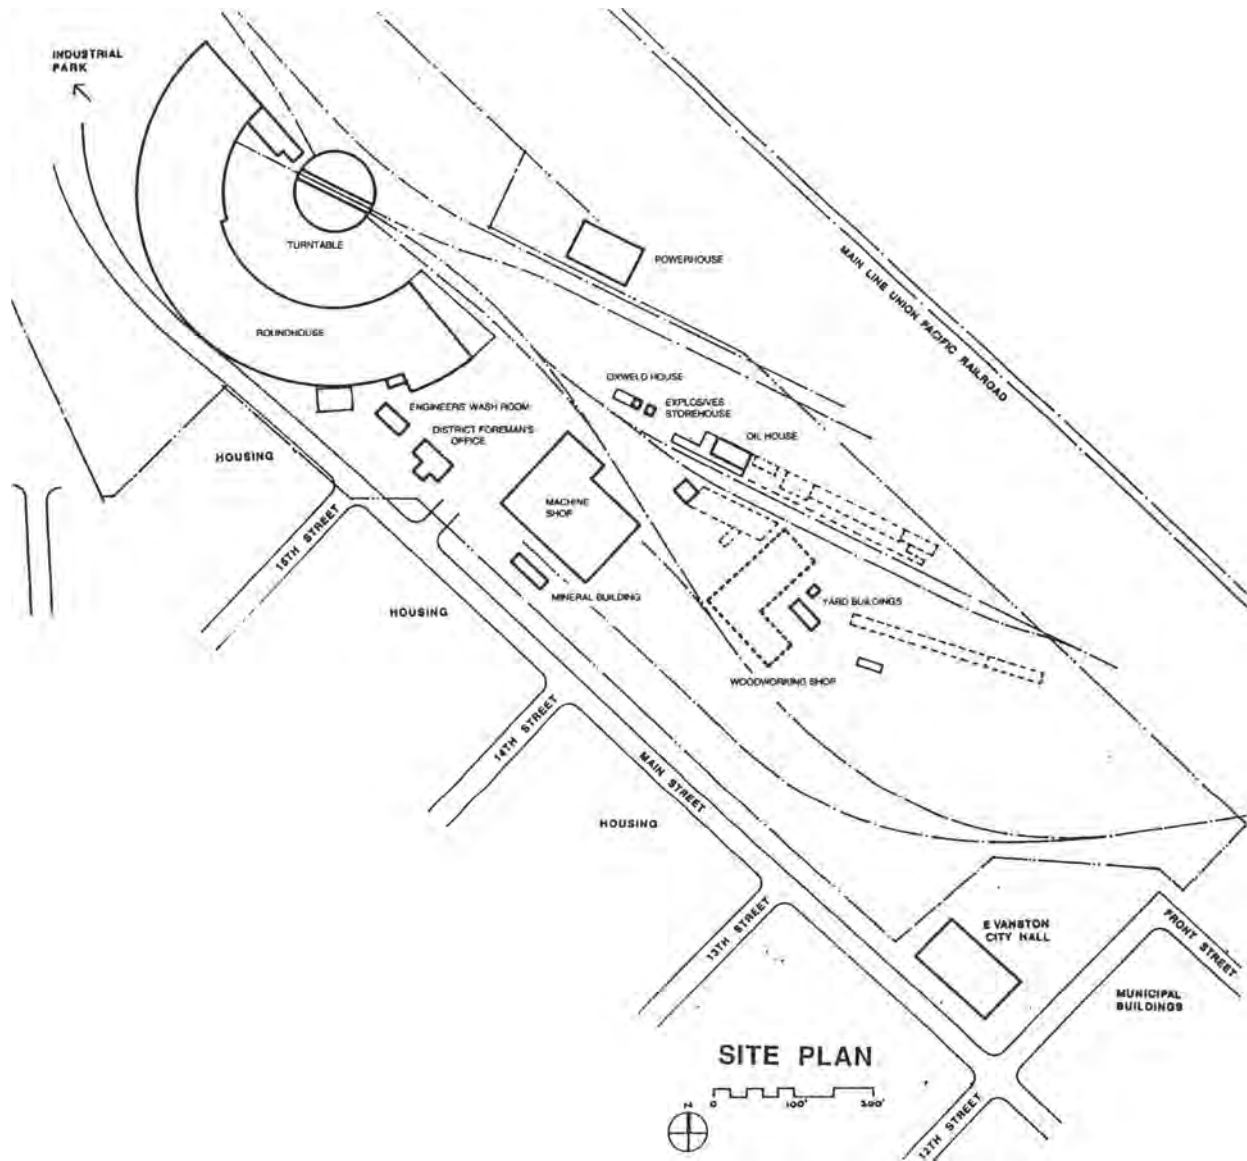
Site Plan of Evanston Union Pacific Railroad Complex, taken from Conditions Assessment by Long Hoeft Architects, 1994.
